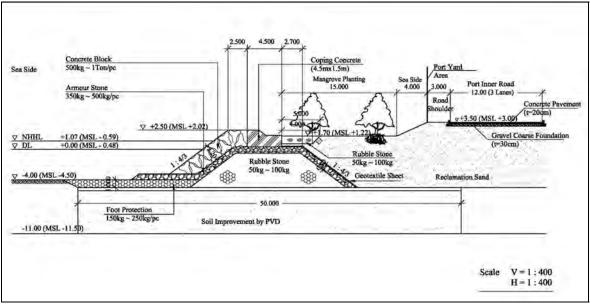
Typical Cross Section of Revetment of East Sides at Cilamaya
